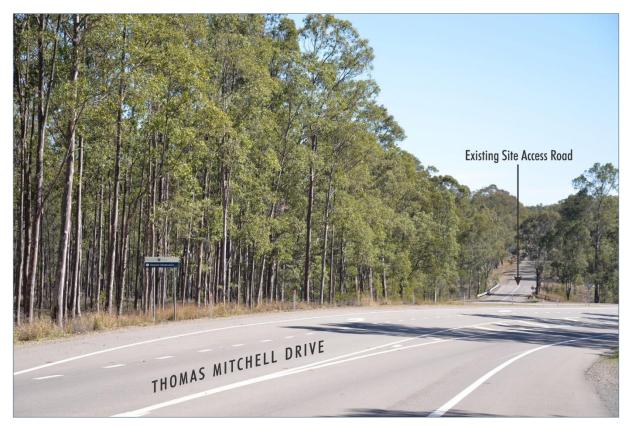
Existing Site Access Road from Thomas Mitchell Drive
